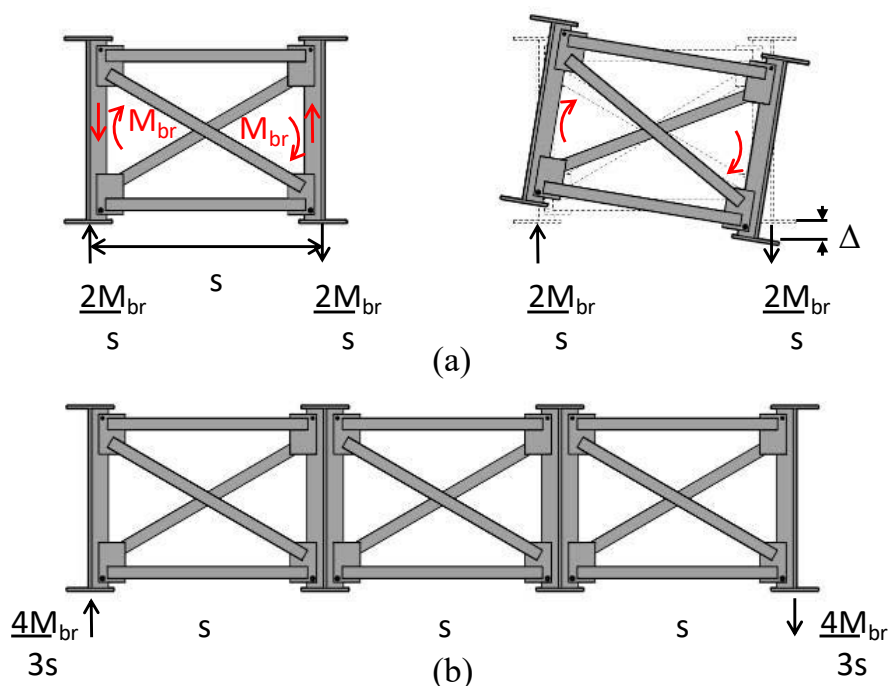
In-Plane Girder Stiffness
